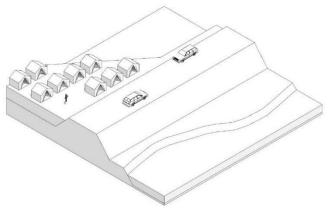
Conceptual sketch of temporary refuges on elevated ground, as part of an existing levee system
